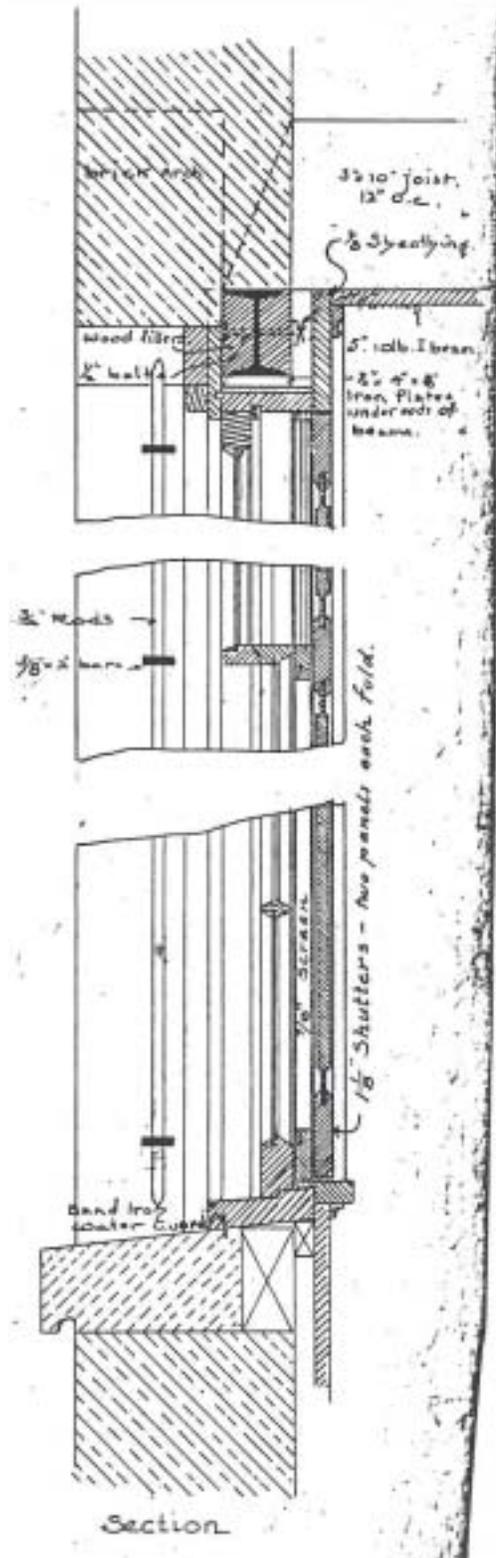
Section of first-story window, as designed in original 1894 drawings and constructed in 1898.
